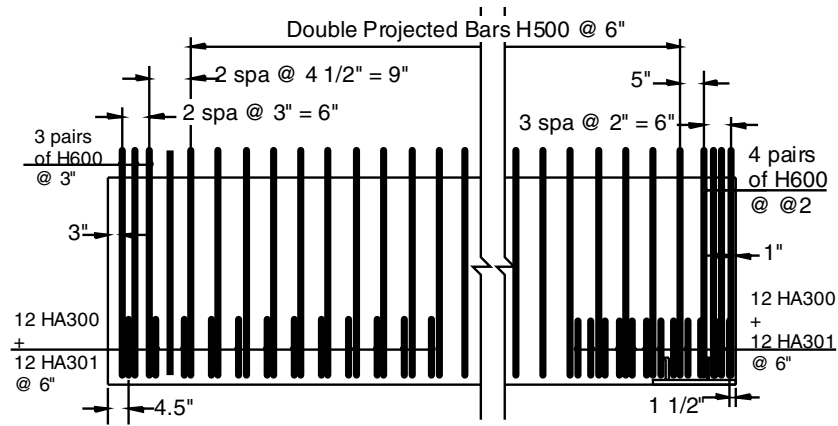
End zone reinforcement details of TN1L (LRFD) and TN1R (proposed).
